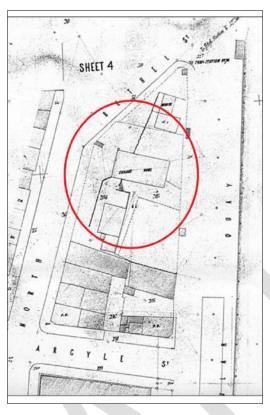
Sydney Water Plan showing the site and associated features including the simple footprint of the Sailor's Home (former), Cadman's Cottage and what appears to be retaining walls and fences. At some stage it would appear that the Morgue building, to the north of the Home, had been extended. (Source: Sydney Water Plan Room, PWD 46 Sheet 4/1554)
